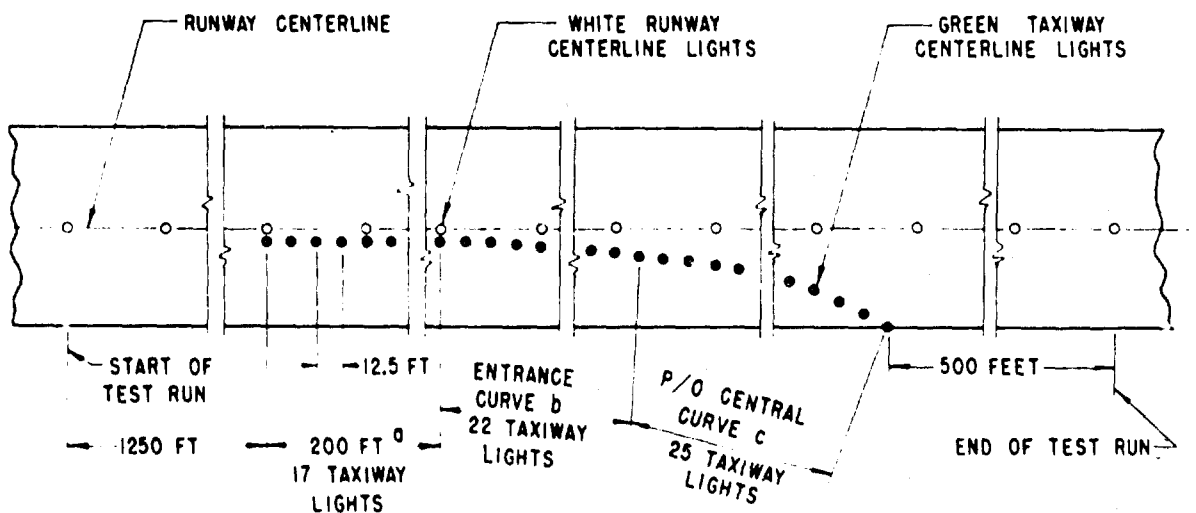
Layout of runway centerline lights for distance-remaining tests.
